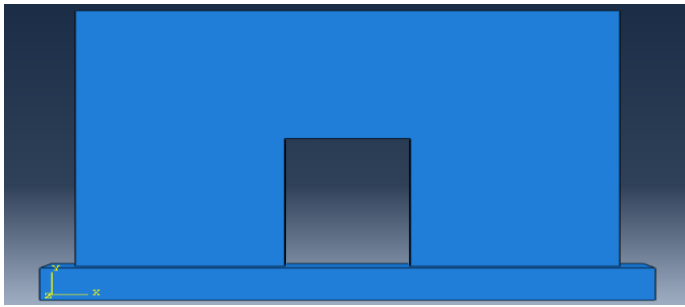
Model 5 Shear wall with size of opening 2 m x 1.2 m
